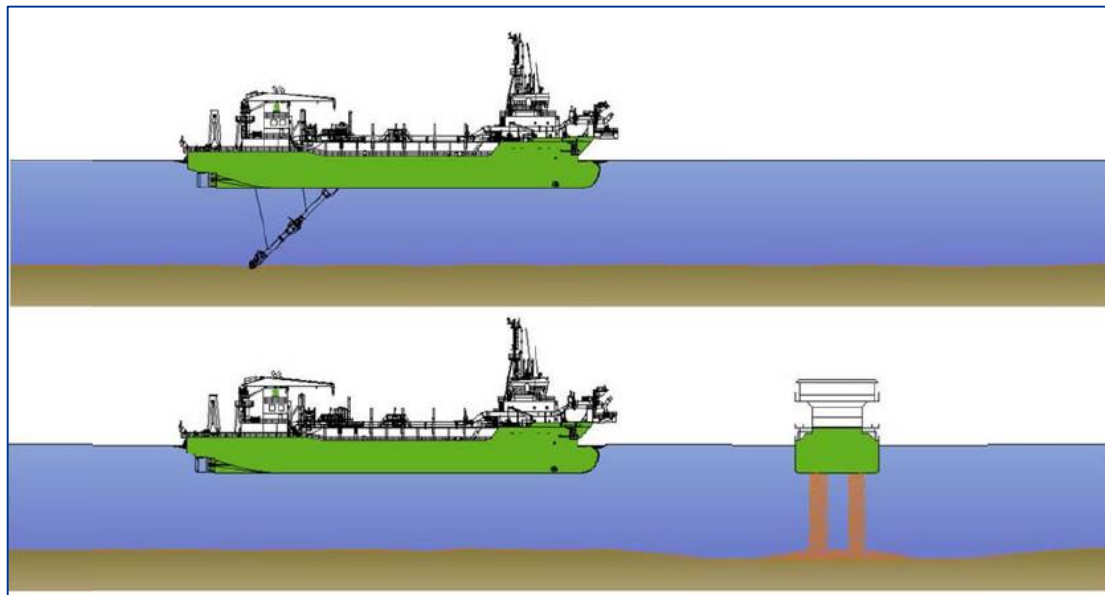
Typical Sub-Sea Trench Construction with TSHD
